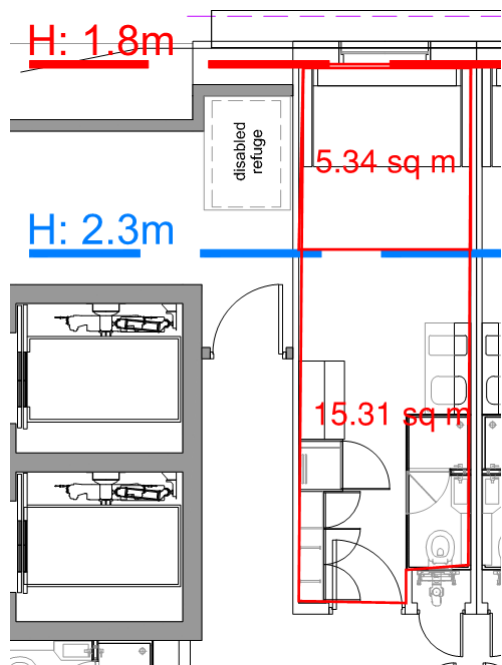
(above): Image of one of the single units, showing the overall floor area and the space within the lower ceiling height
